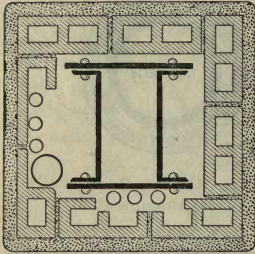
Column Protection, Calvert Building, Baltimore Fire.
